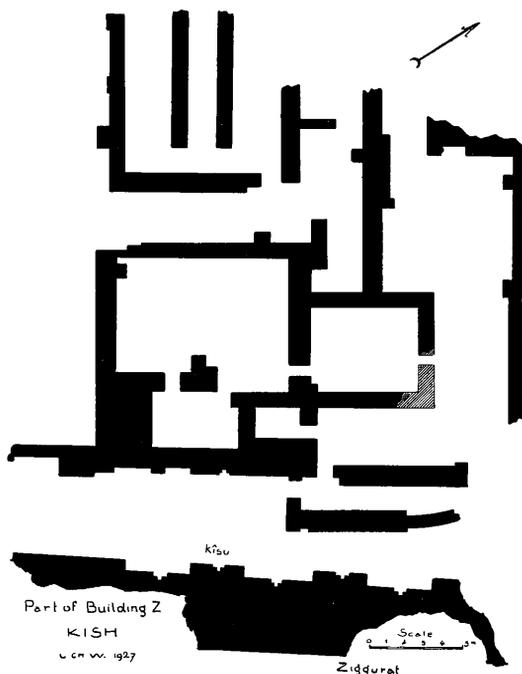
Ground plan of Building in Mound Z, north of the great Ziggurat. Retaining wall of the N. W. side of the Ziggurat, Sargonic period; (See p. 45).
